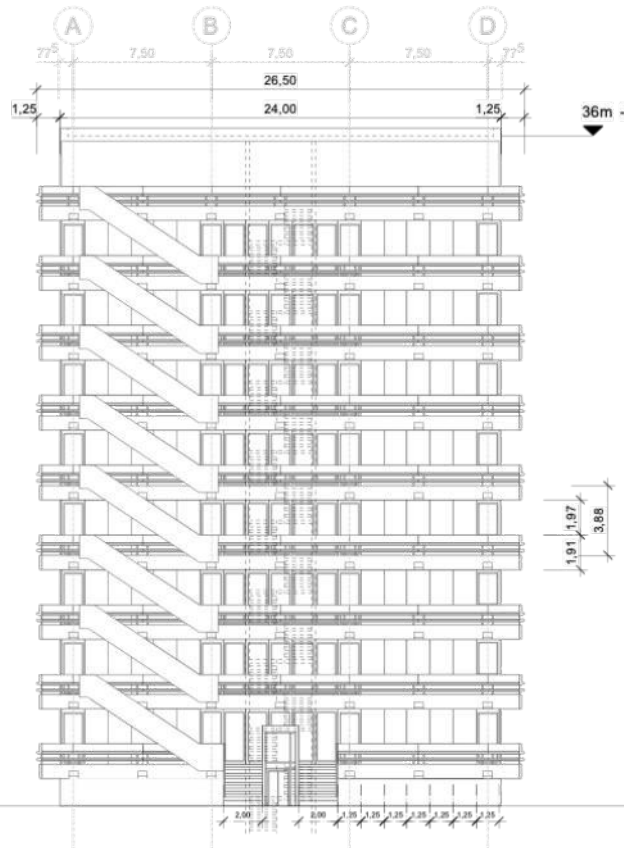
Elevation on west side of the existing building under investigation for the timber-reuse retrofitting.
